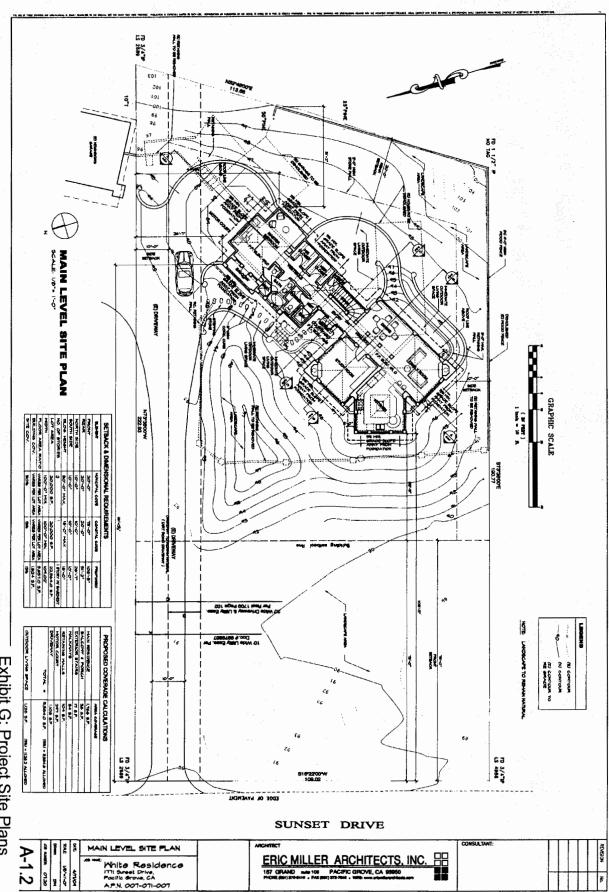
Exhibit G: Project Site Plans 3-09-012; White Demo and Rebuild Page 2 of 6
